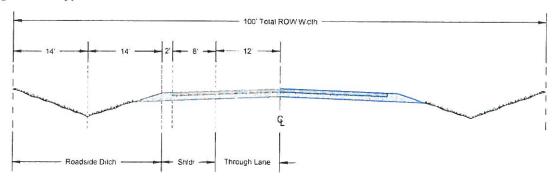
Typical Rural Principal Arterial Partial Cross-Section (4 Lane)
